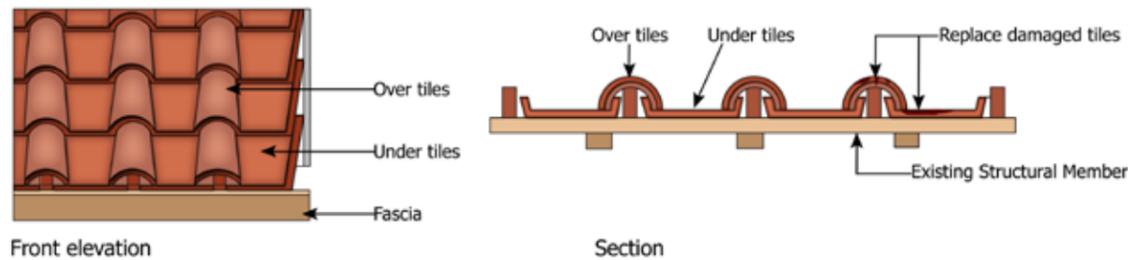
Detail of Allahabad tiles, Source: Civil Engineering Blog, Sanjay Sharma, 2017
